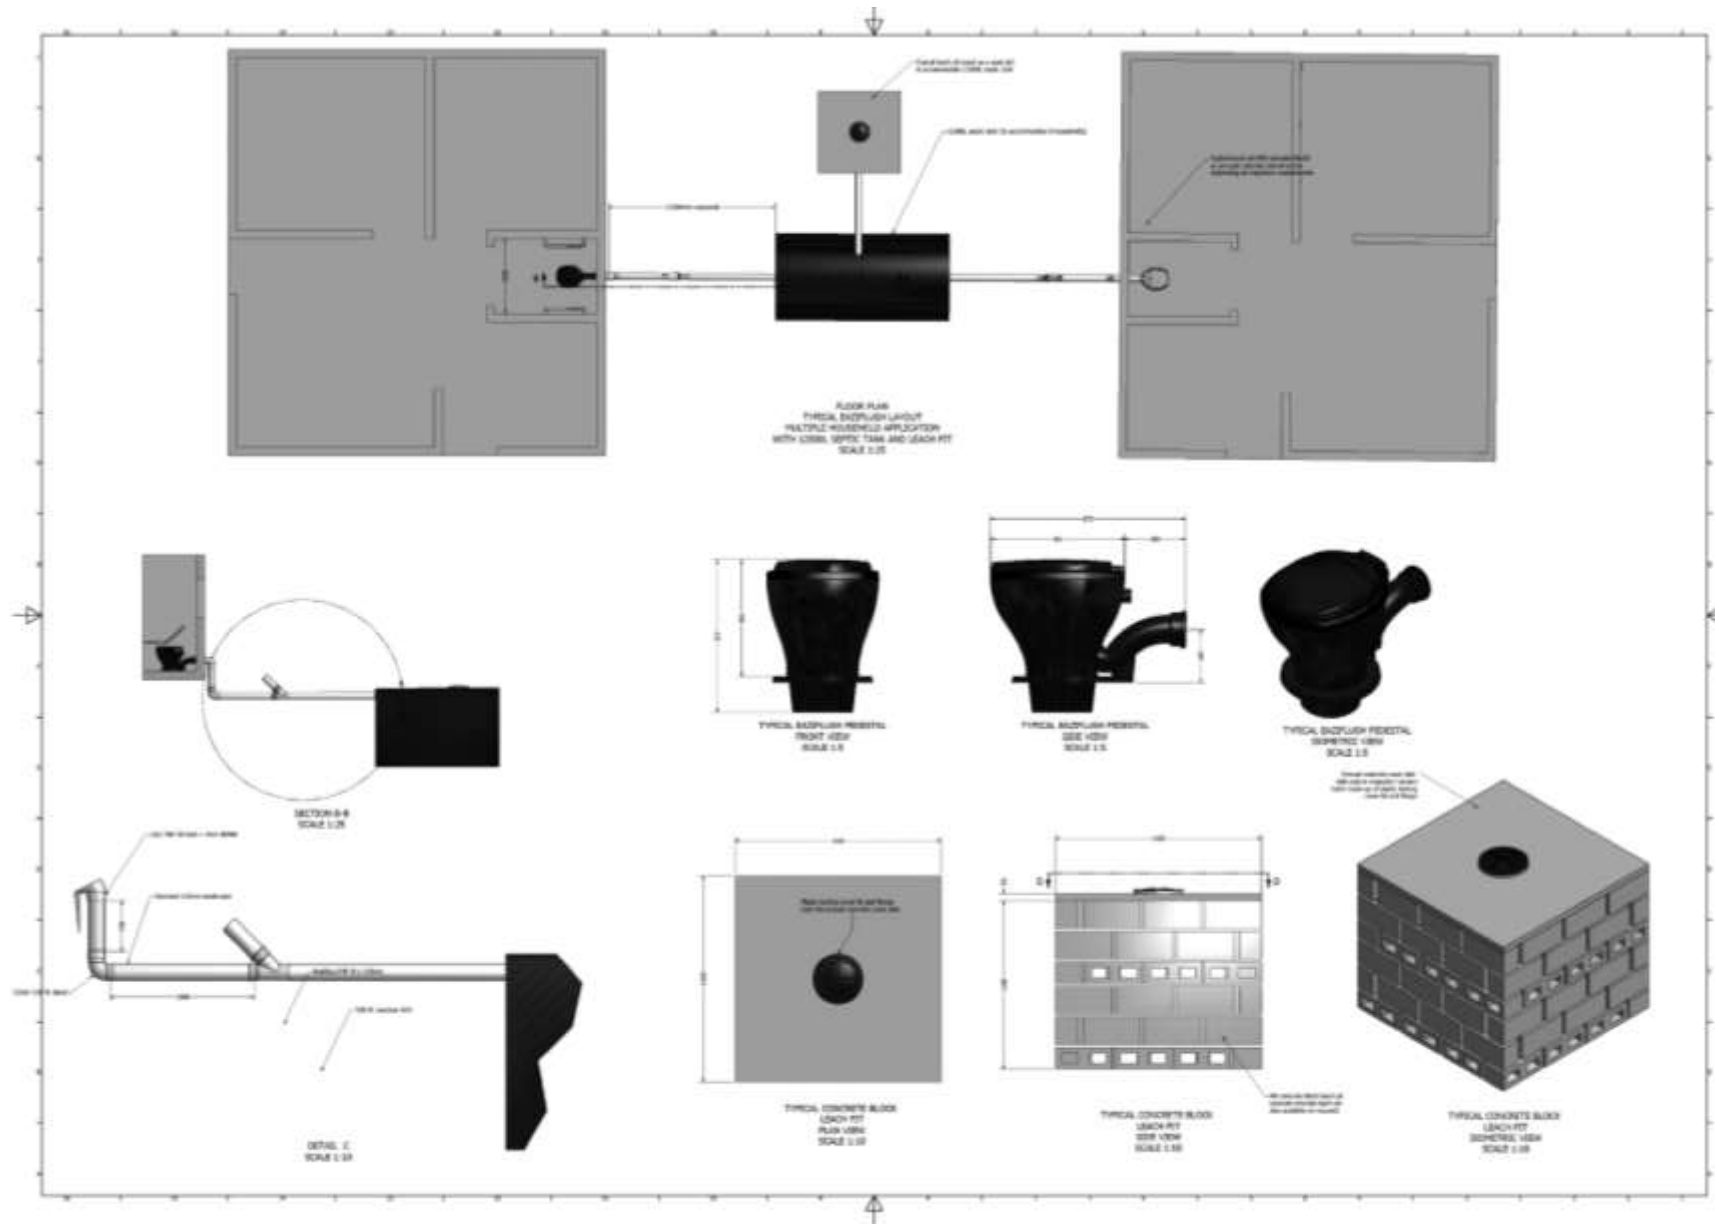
Proposed sanitation design for institutional buildings (leach pit with septic tank) (Makhetha 2016)
